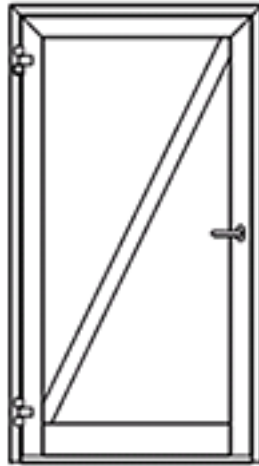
Vertical stiles and horizontal rails (glazing bars)- change angle
